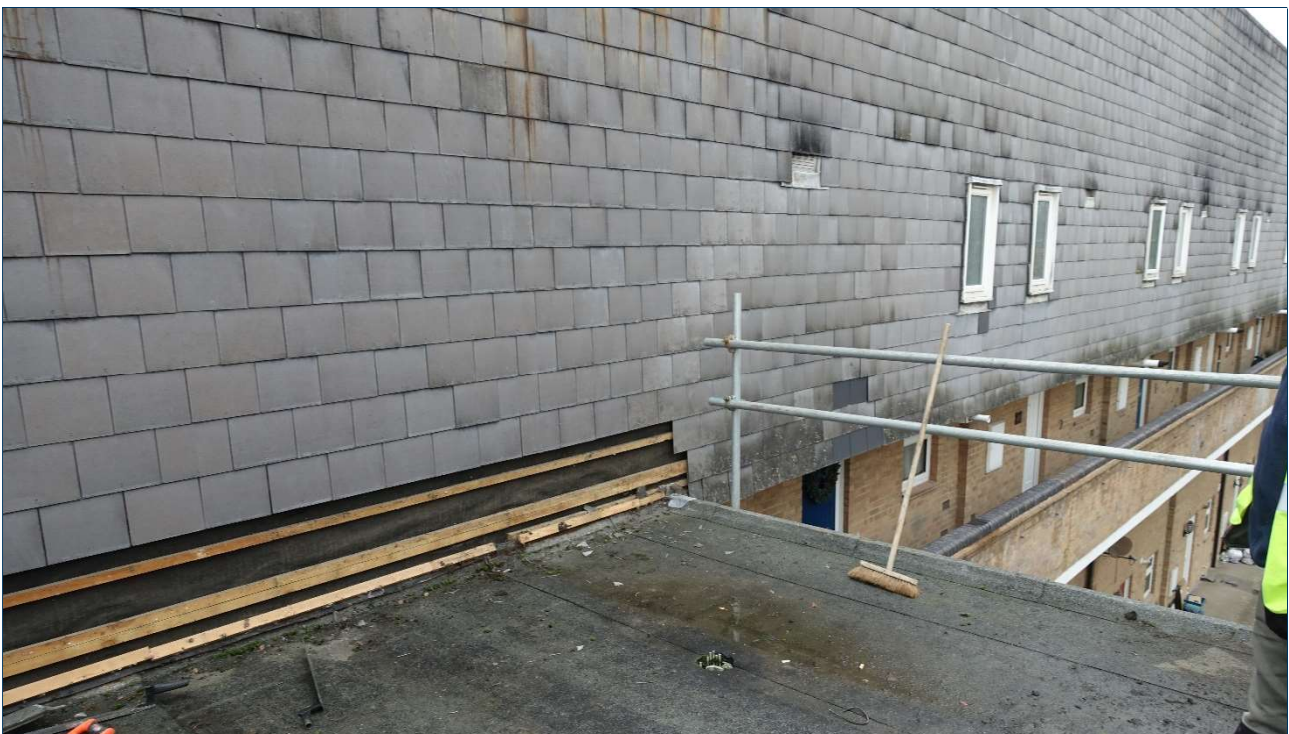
Vertical Wall Cladding – Area No.2 Exposed
